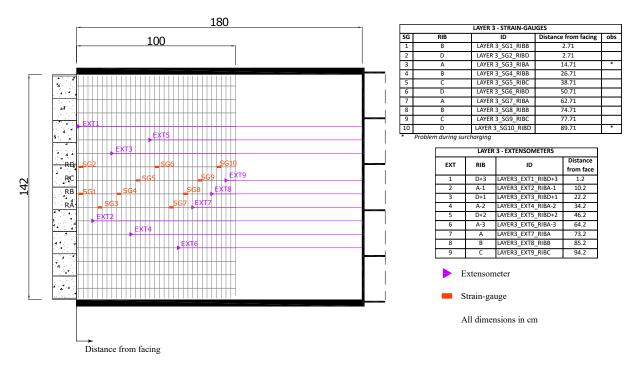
Extensioneter and strain-gauge locations for layer 3, with distances of the measuring points from the facing summarized at the right tables (See Figure 5.25 for reinforcement layer elevations). Same configuration for layers 4 and 5.
